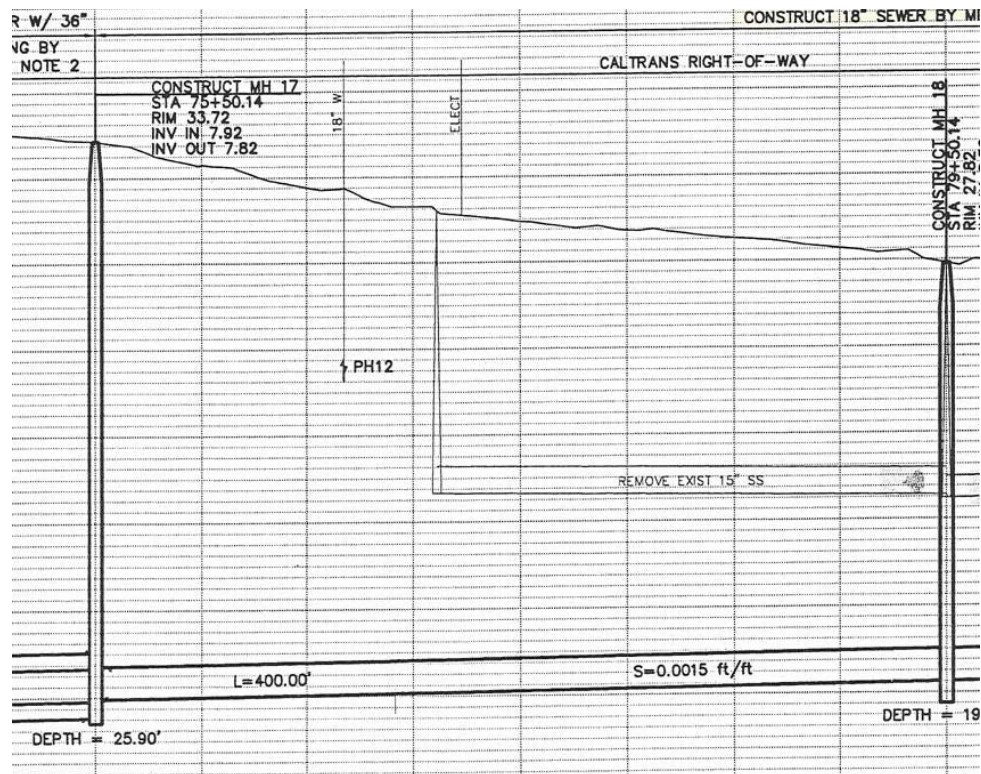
Alvarado Boulevard Trunk Sewer – Profile of Drive 17 from Manhole 17 to Manhole 18 (Calderwood, 2002).
